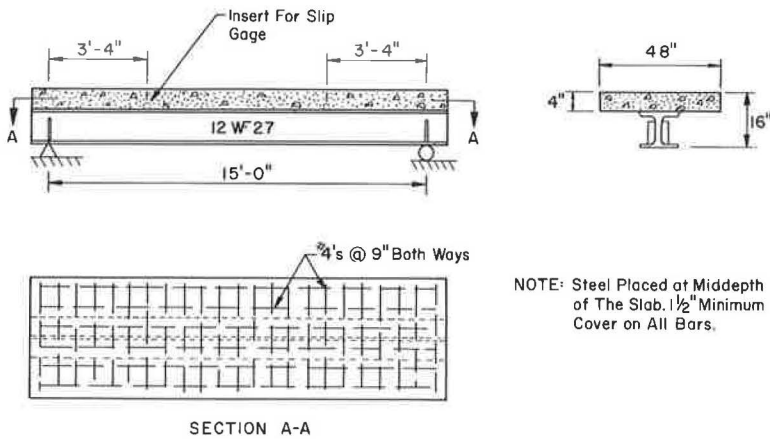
Typical beam fatigue specimens BF-1 through BF-8.
